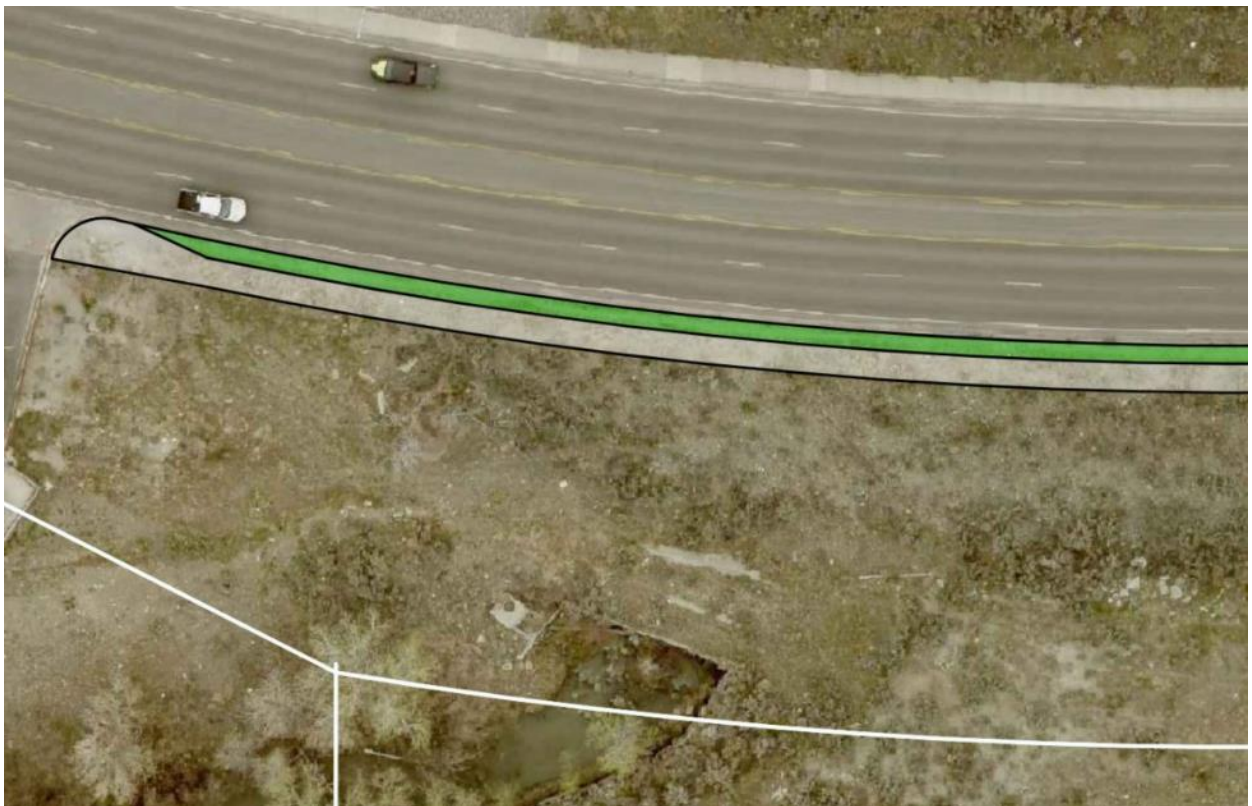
Yellowstone Avenue Concept near Sulphur Creek culvert
